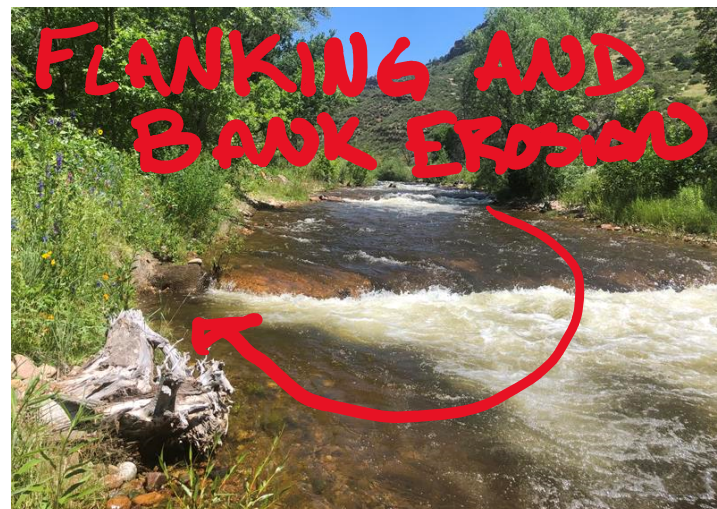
Cross channel structure stability, flanking, bank erosion, looking upstream
